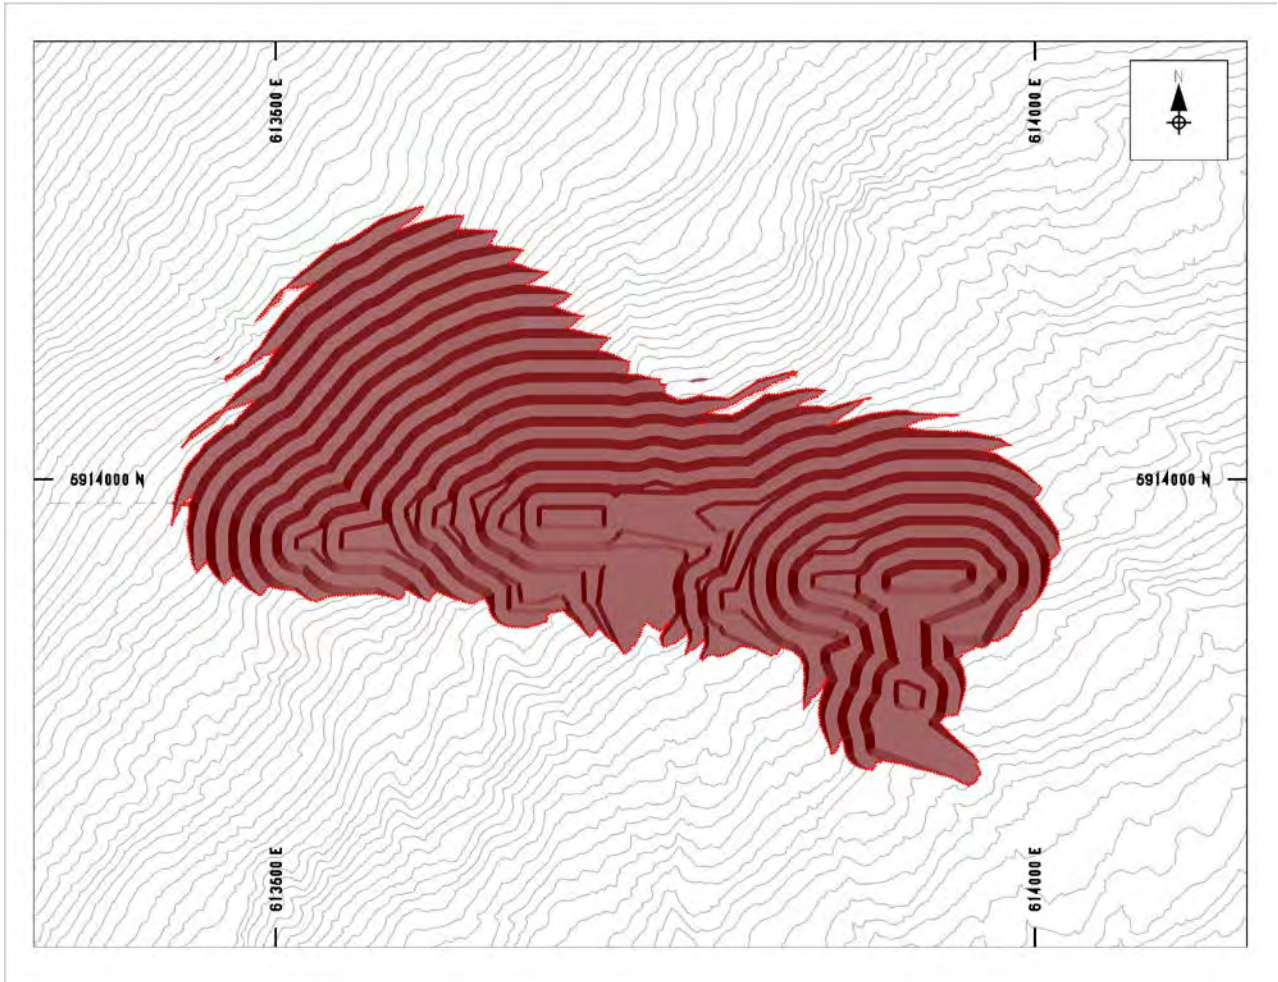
Plan View of Phase D654i with the Pit Limit Outline
